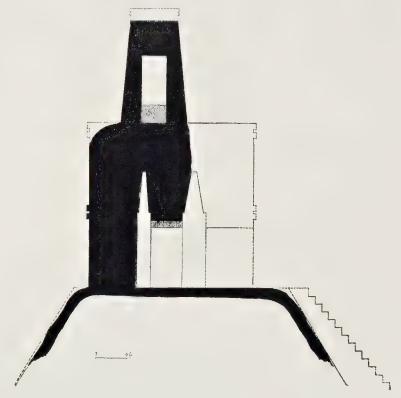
Temple A: cross-section showing room in tower and width of rooms.
